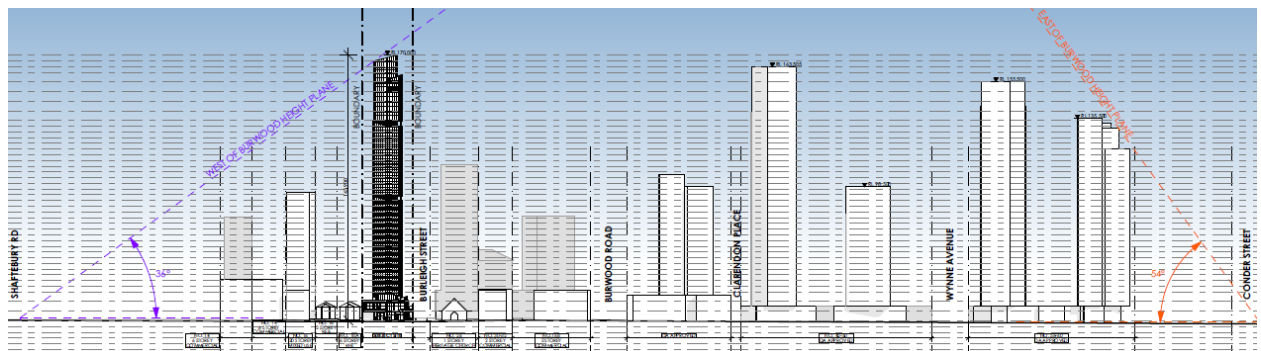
Extract of the Railway Parade Height Plane including the proposed development and approved Burwood Place towers
